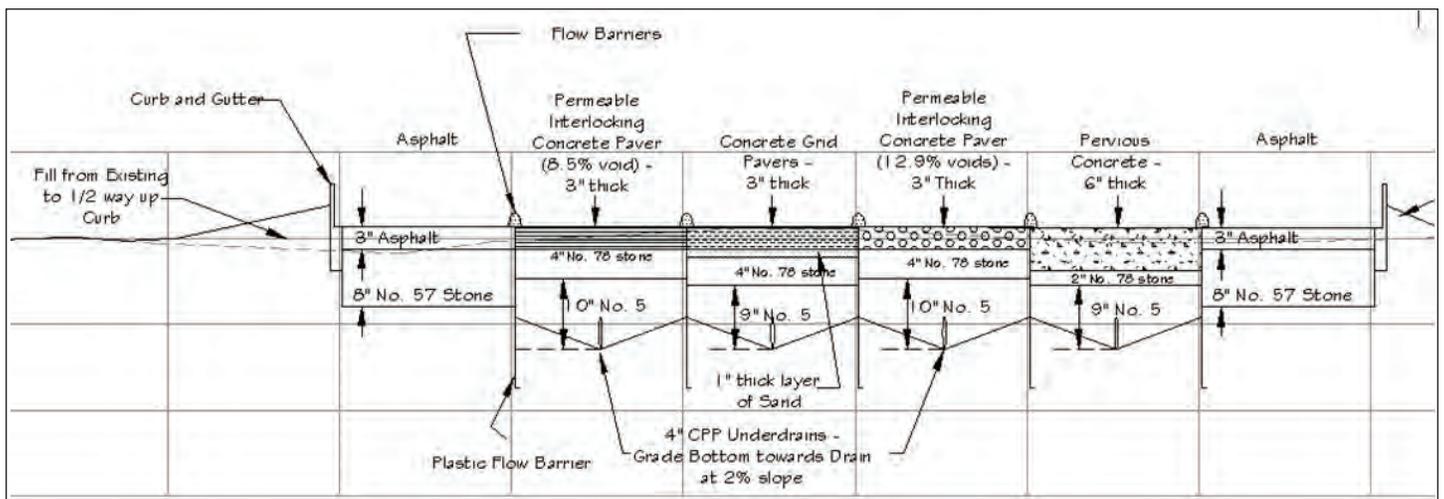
Parking lot cross section showing pavement and base thicknesses in inches (1 inch = 25.4 mm)
